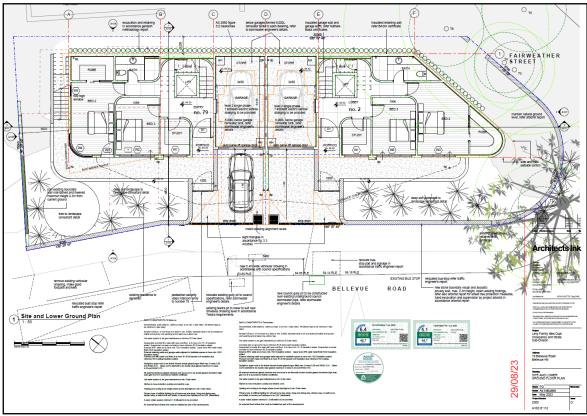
Site and lower ground floor plan. Source: Submitted Architectural Plans
